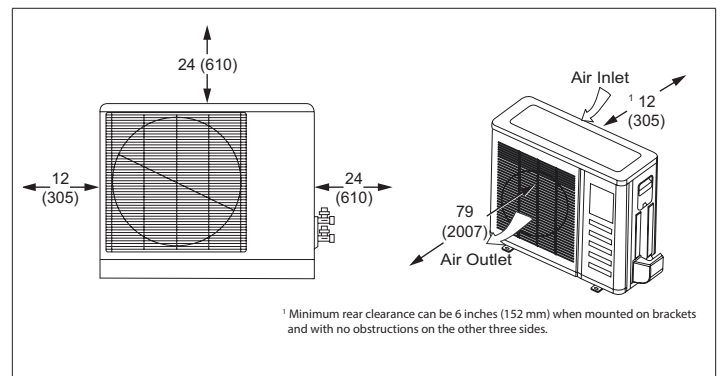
Single Outdoor Unit Clearances - Inches (mm)
